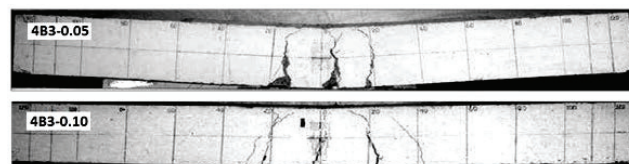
Actual crack pattern of beam 4B3-0.05 and beam 4B3-0.10.
